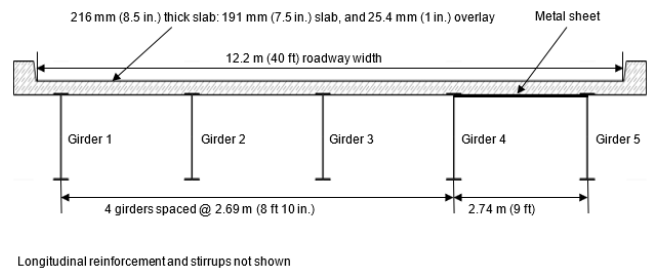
Cross-sectional view of Laramie bridge (direction of traffic).
